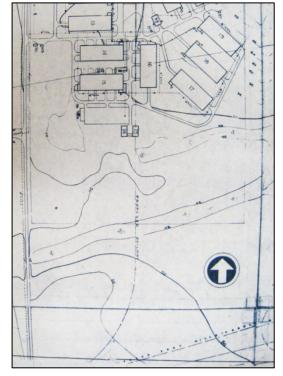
Detail of plan dating to 1967 showing former sewer farm at the southern end of the SME site (National Archives C4177/FOLDER64).
